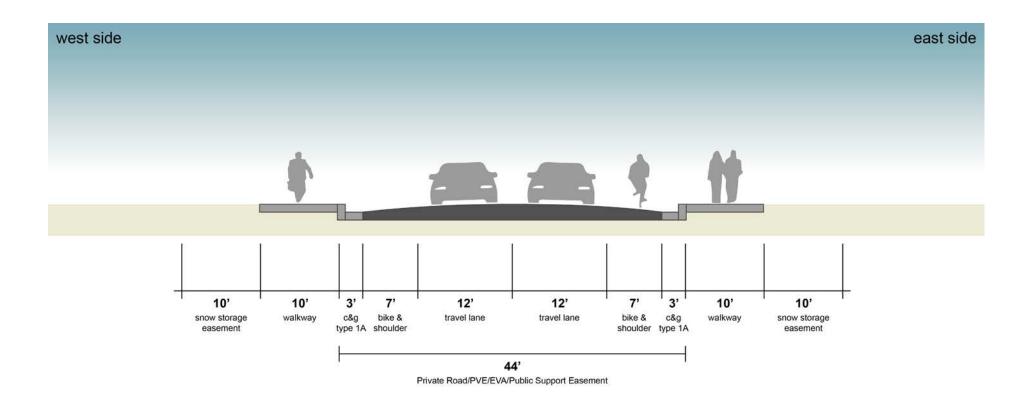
SECTION D: VILLAGE EAST ROAD
